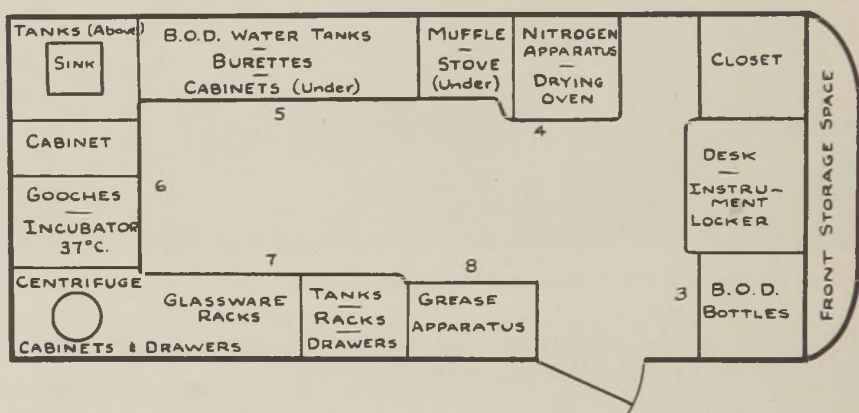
Floor plan of laboratory in 6½ ft. × 15 ft. trailer. Figure numbers of photographs noted on plan.
